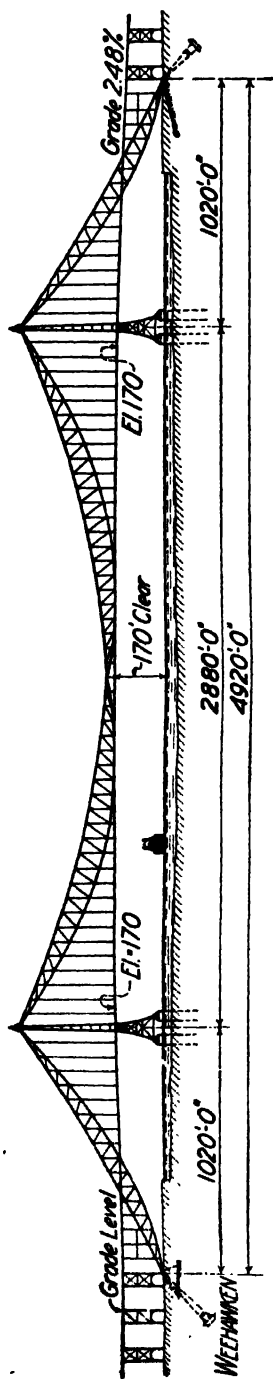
Proposed Suspension Bridge over the North River, New York City.
